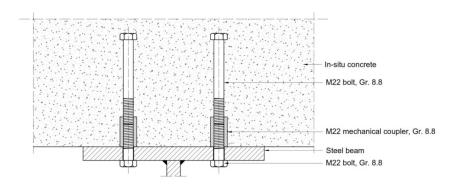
Layout of the shear connection system tested by Yang et al. [60]
